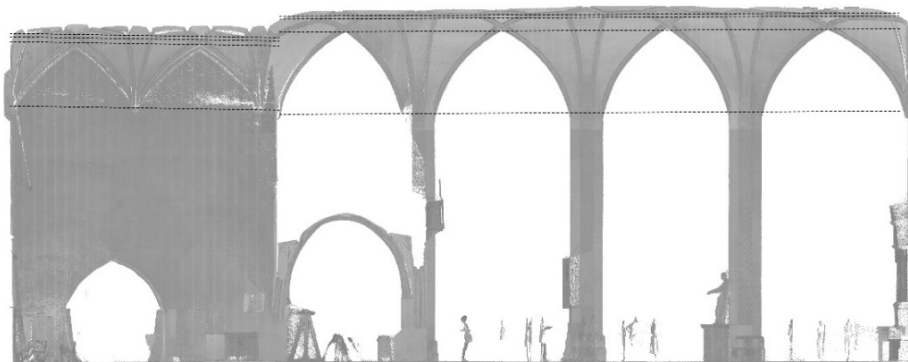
The examination of the vault system's longitudinal sections. The longitudinal sections of the southern aisle looking to the north. The authors' work
